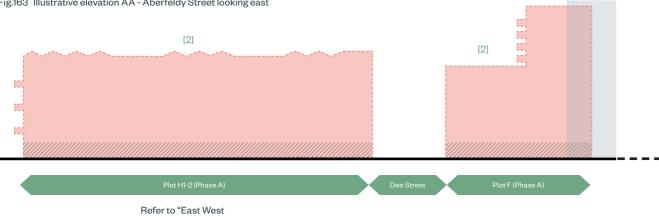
Illustrative elevation AA - Aberfeldy Street looking east
